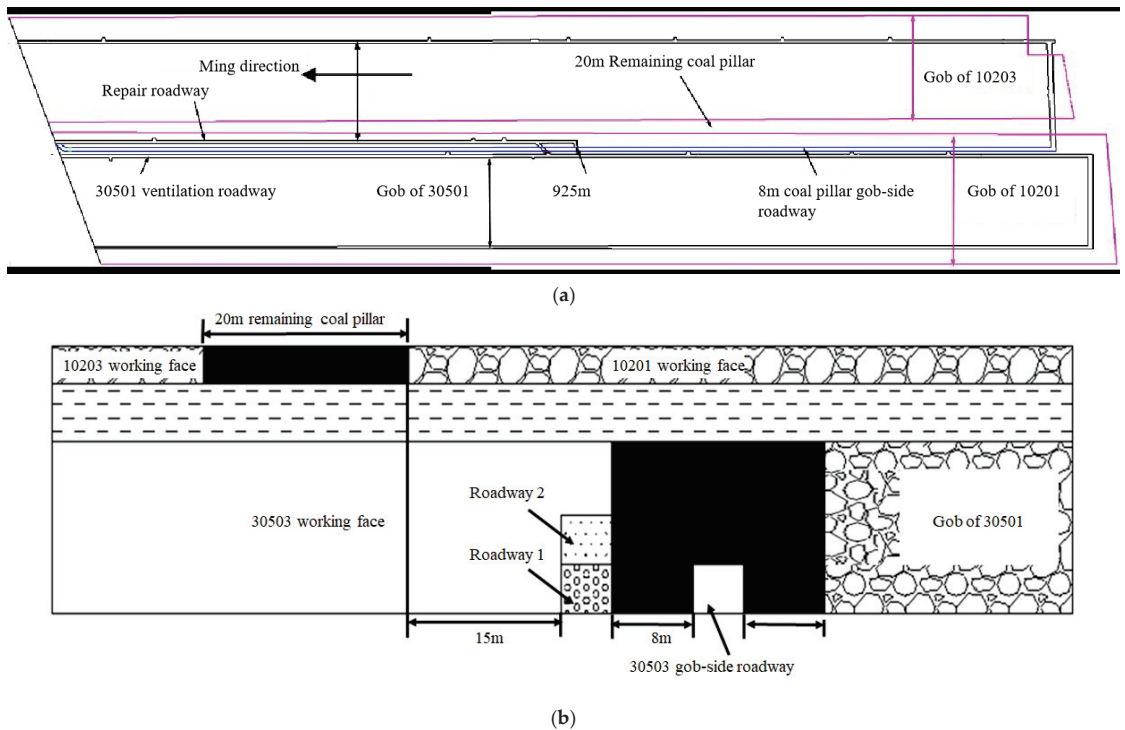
Diagram of the 30,503 working face layout. (a) Layout plan. (b) Cutaway layout.
